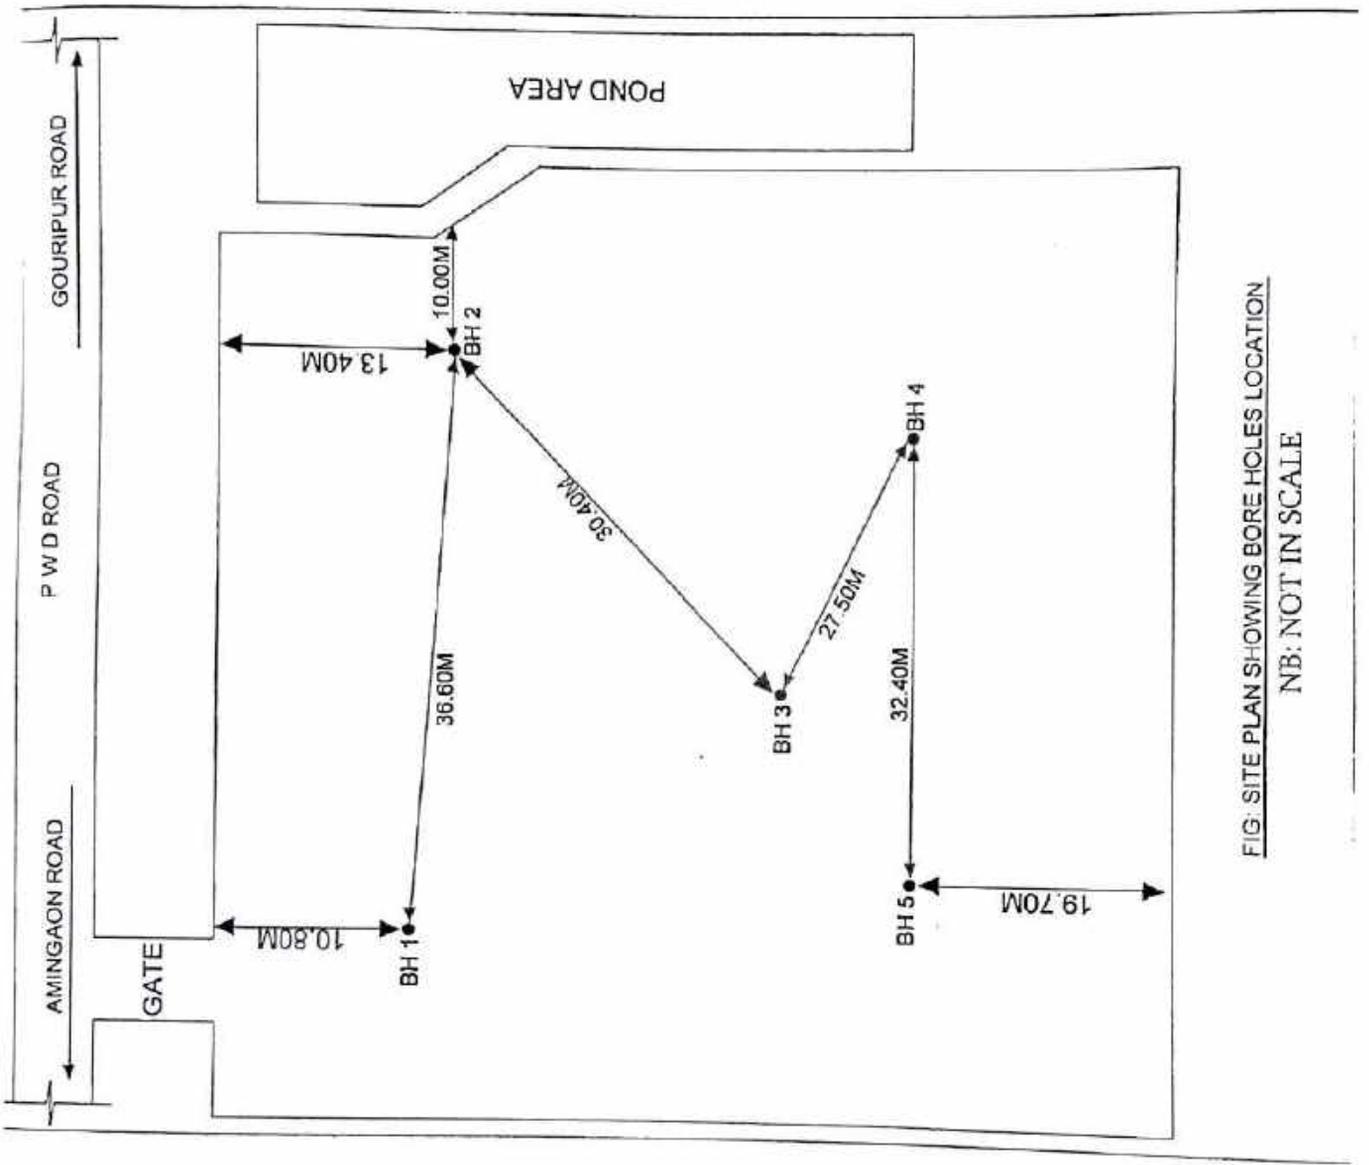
FIG: SITE PLAN SHOWING BORE HOLES LOCATION
